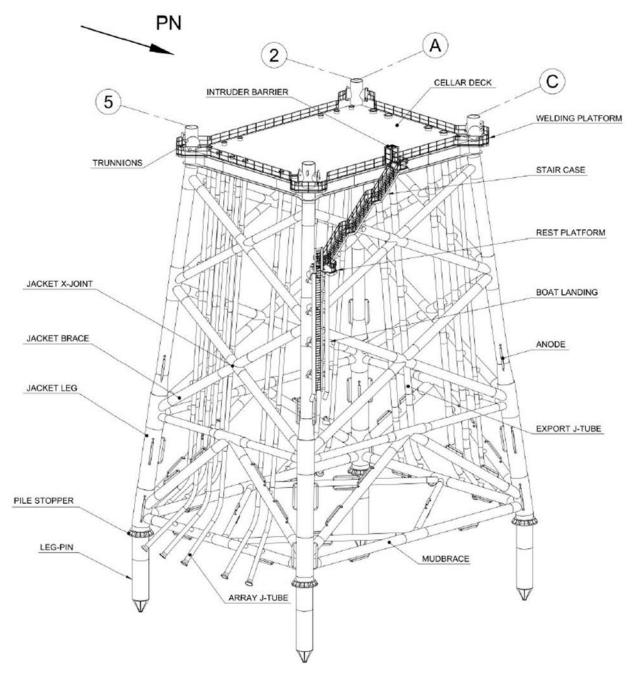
Example Schematic of the Offshore Substation Jacket Foundation (Figure provided courtesy of Ramboll)
